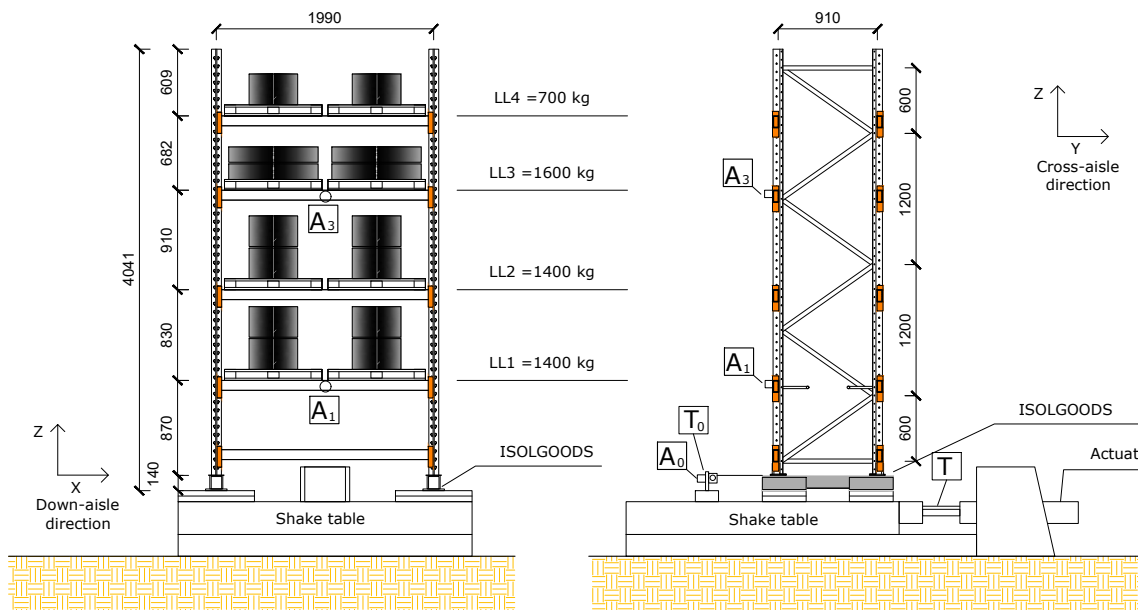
Test setup (all dimensions in mm): a) Elevation view; b) Side view
